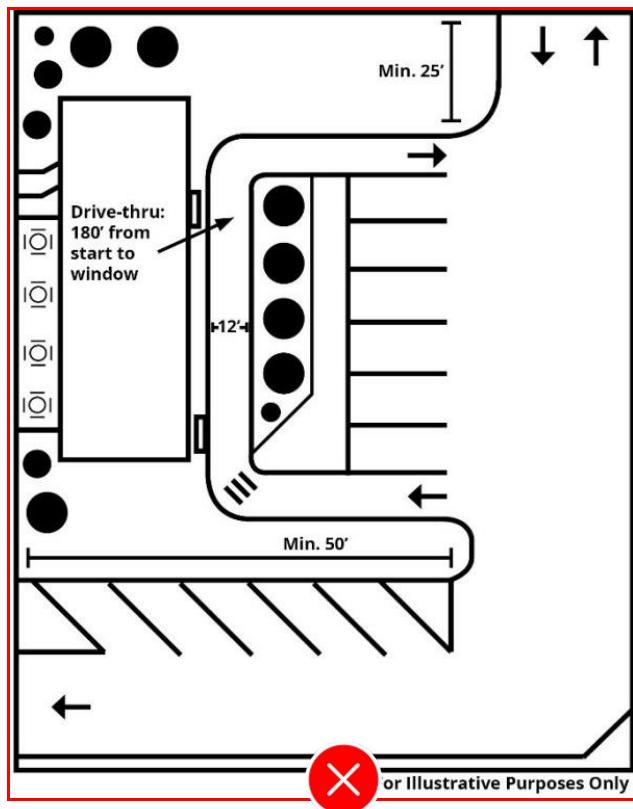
(2) Drive-thru Facility with Front Drive Aisle
